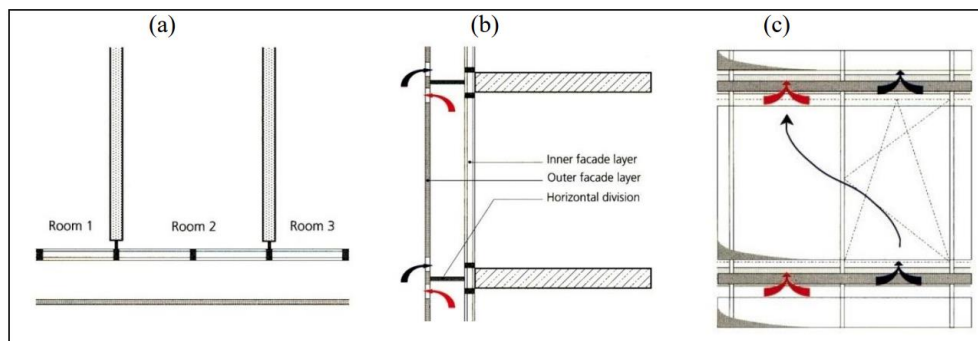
Corridor facade: plan (a); section (b) and elevation (c) (Osterle, 2001).
